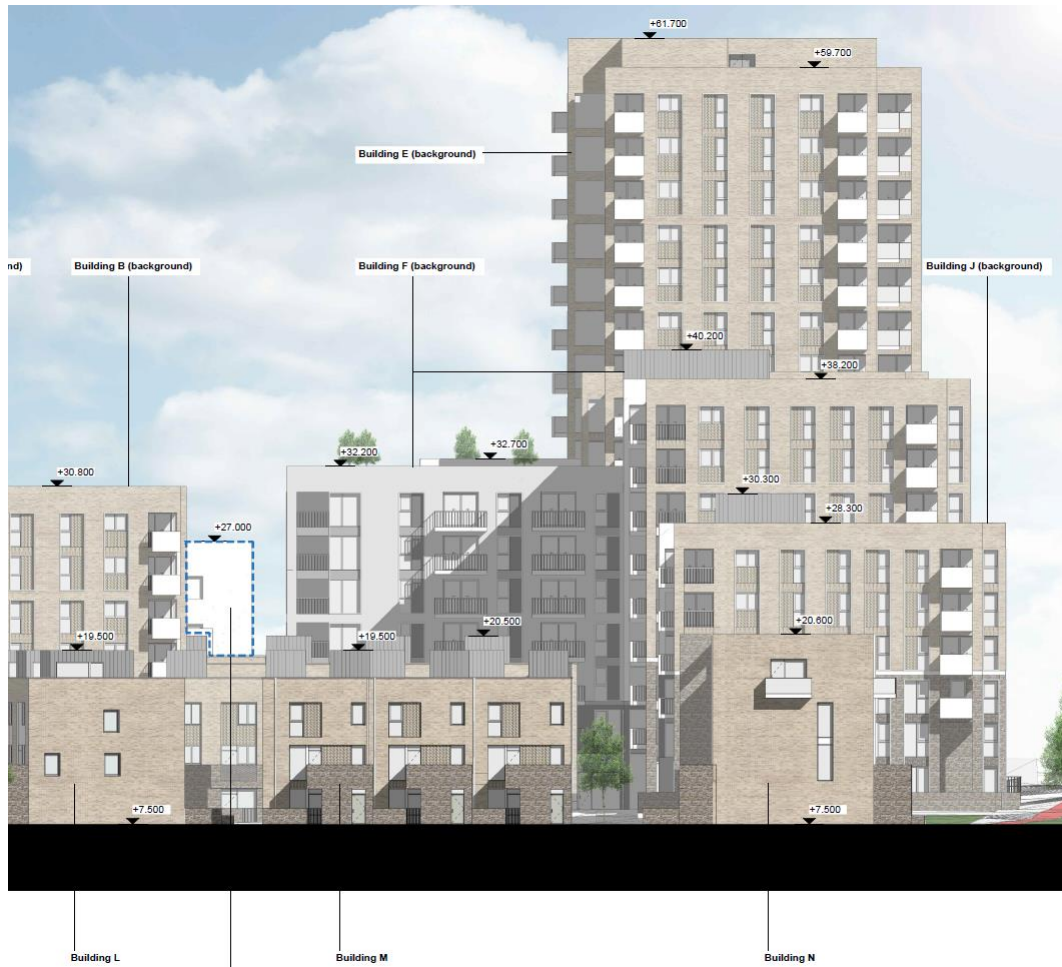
South-facing Facades | not to scale [source: Reddy]
